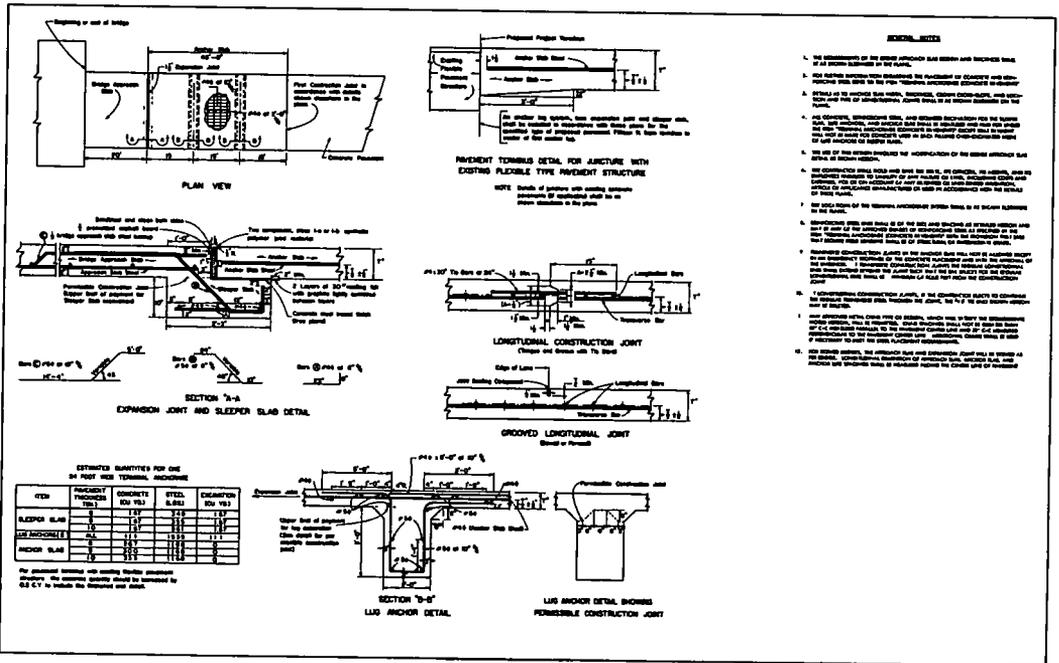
Terminal anchorage for concrete pavement jointed, TA(CPJ)-61, Texas Highway Department.
